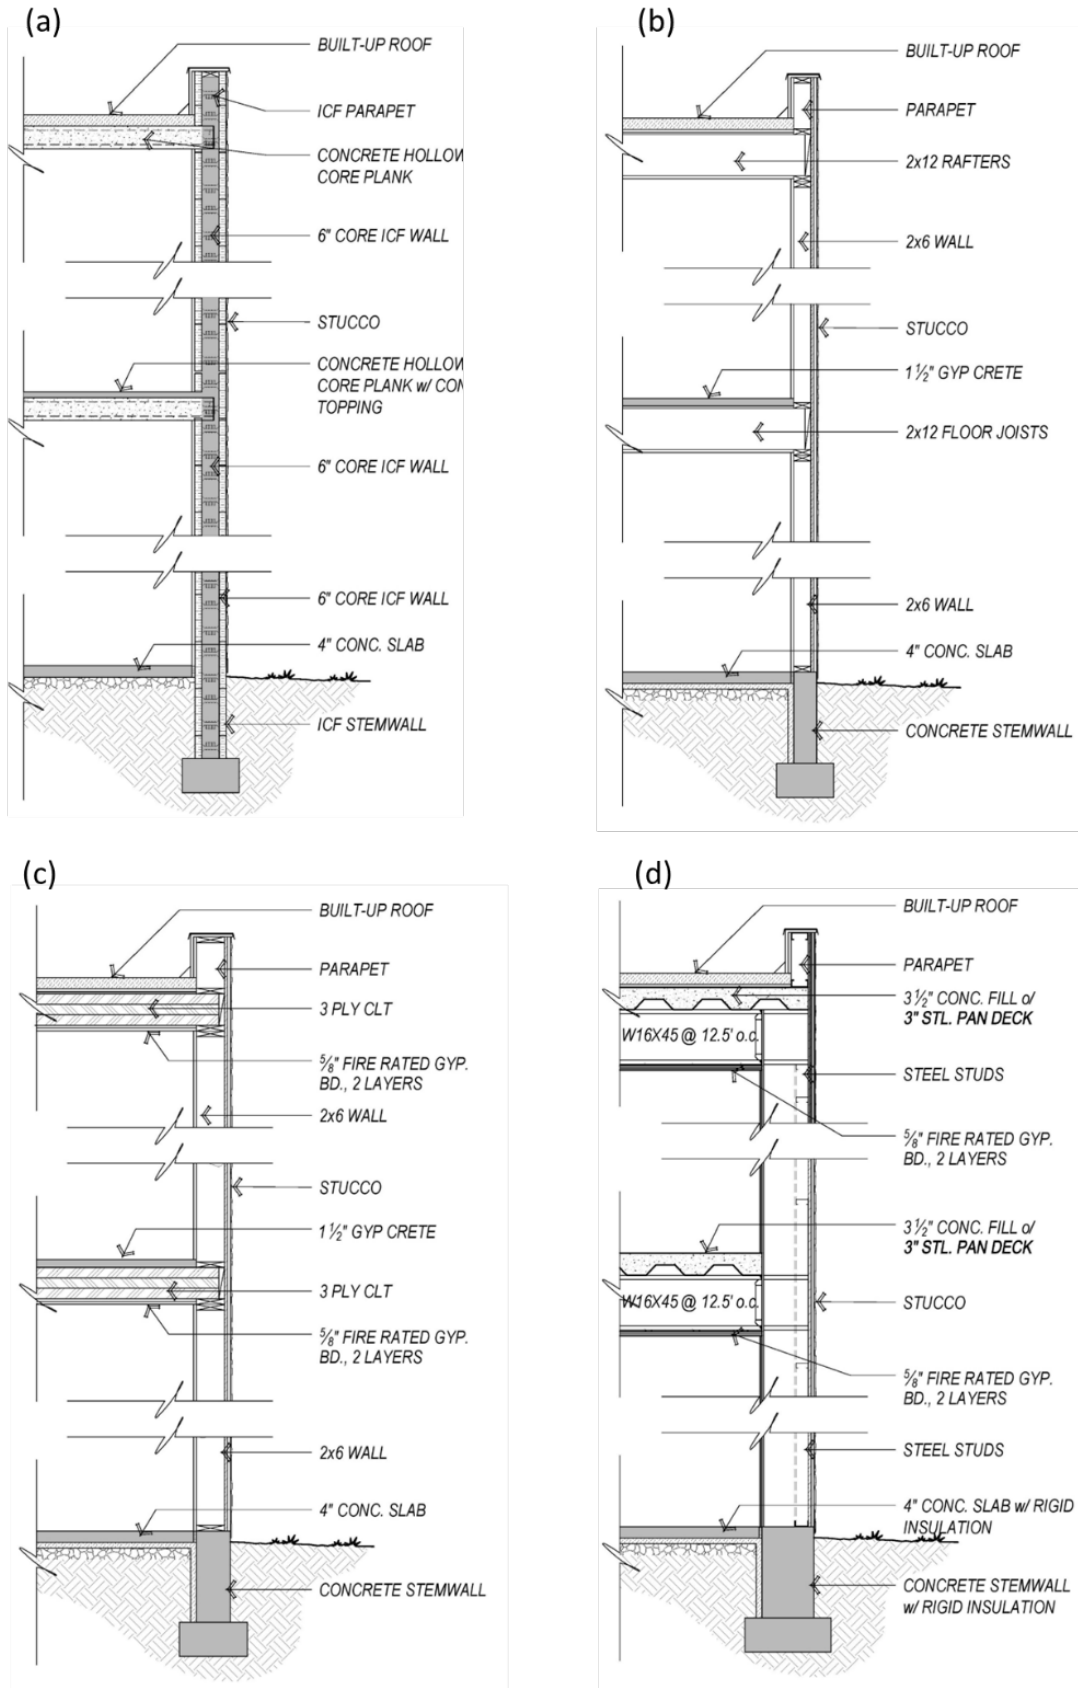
Typical exterior wall sections (a) ICF, (b) traditional wood, (c) CLT, (d) steel frame
